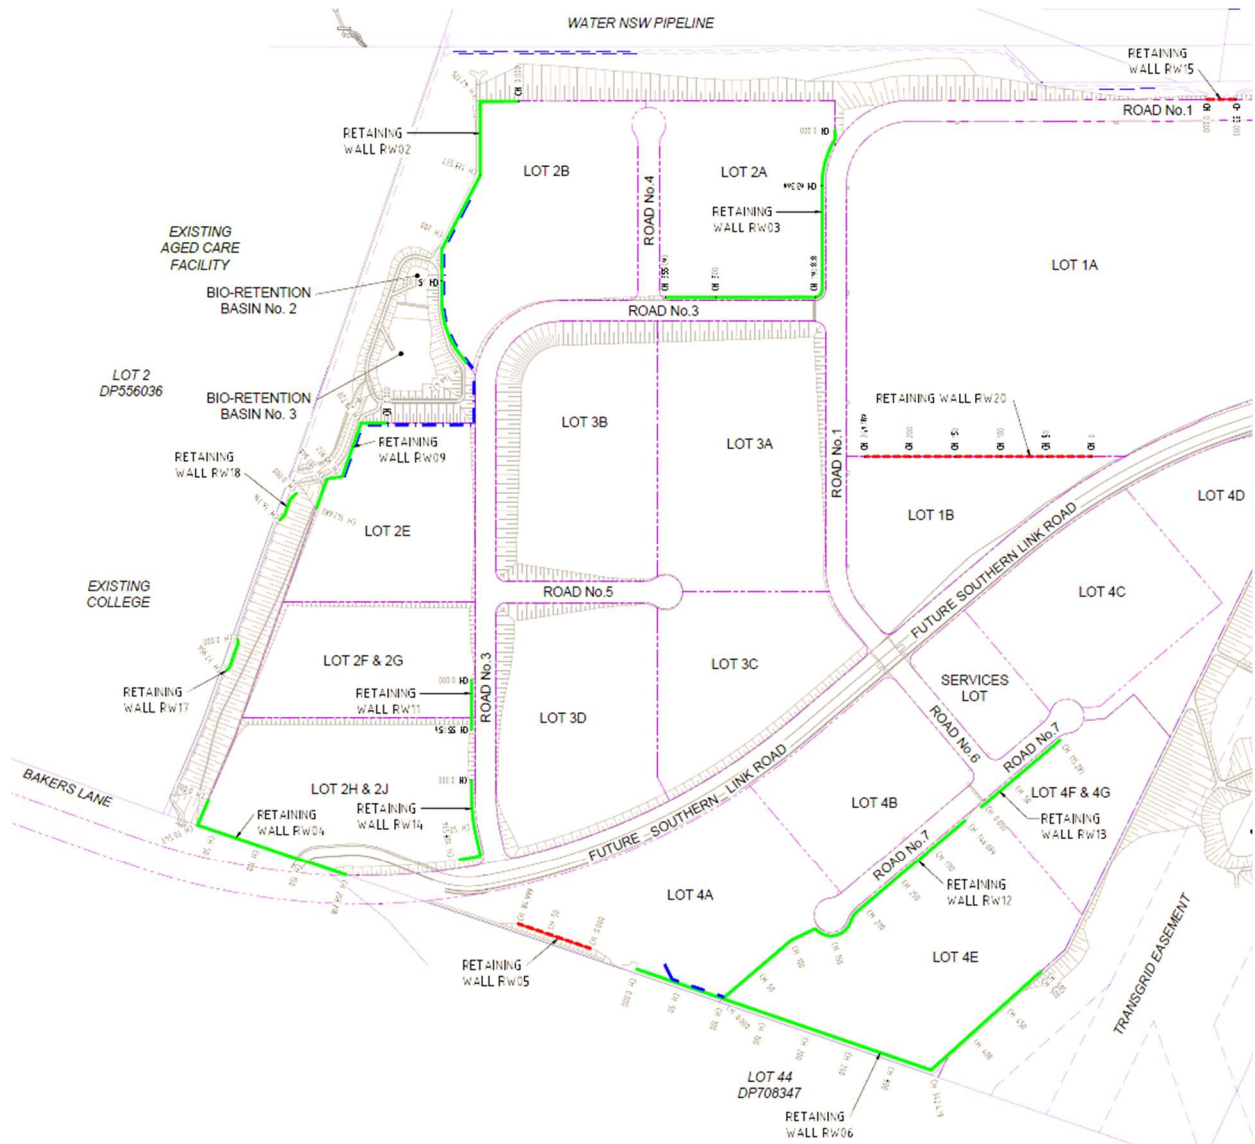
Previous Retaining Wall Locations as per Modification No. 2
